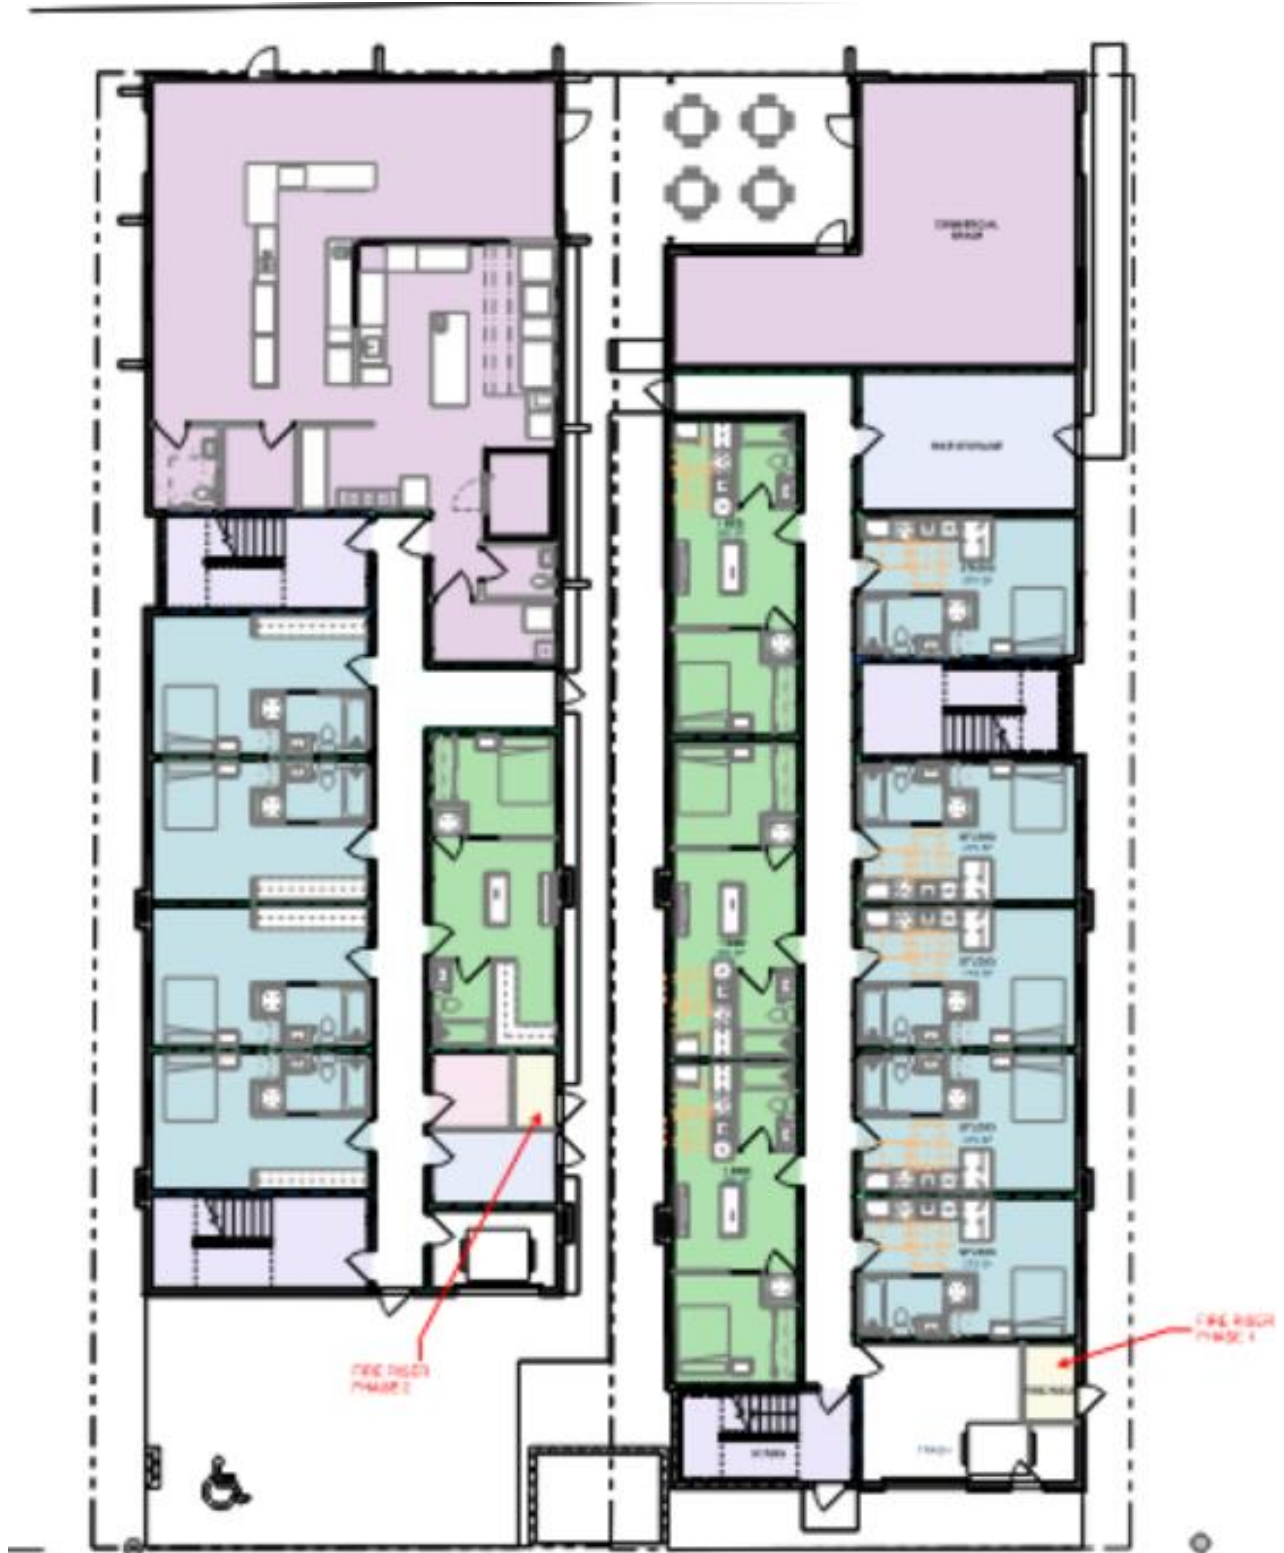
Site Plan showing the combined development, Buildings 1 & 2 main floor
